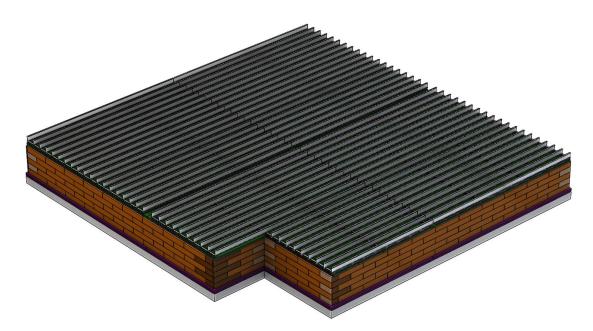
Transformation of the Storage Facility (building 158) into the Repository: general view of the metal support structure supporting 5.8 m thick engineering barrier [10]
